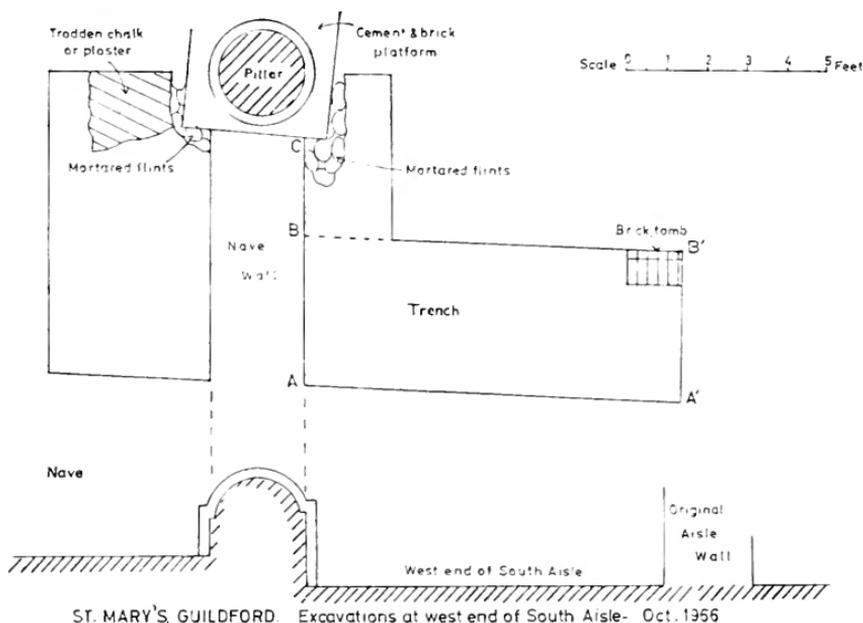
ST. MARY'S, GUILDFORD: PLAN OF TRENCH DUG TO LOCATE ORIGINAL SOUTH AISLE AND NAVE FOUNDATIONS.
